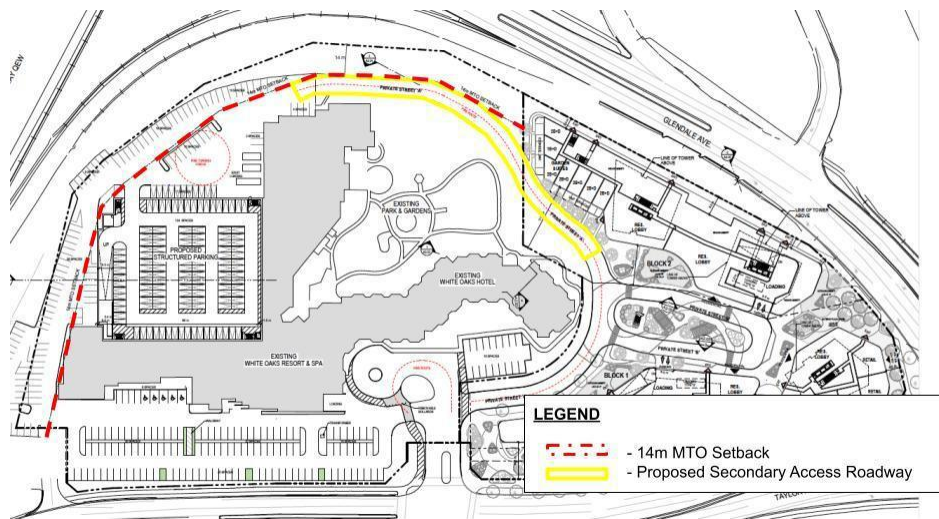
Proposed Secondary Access Roadway and MTO Setback
